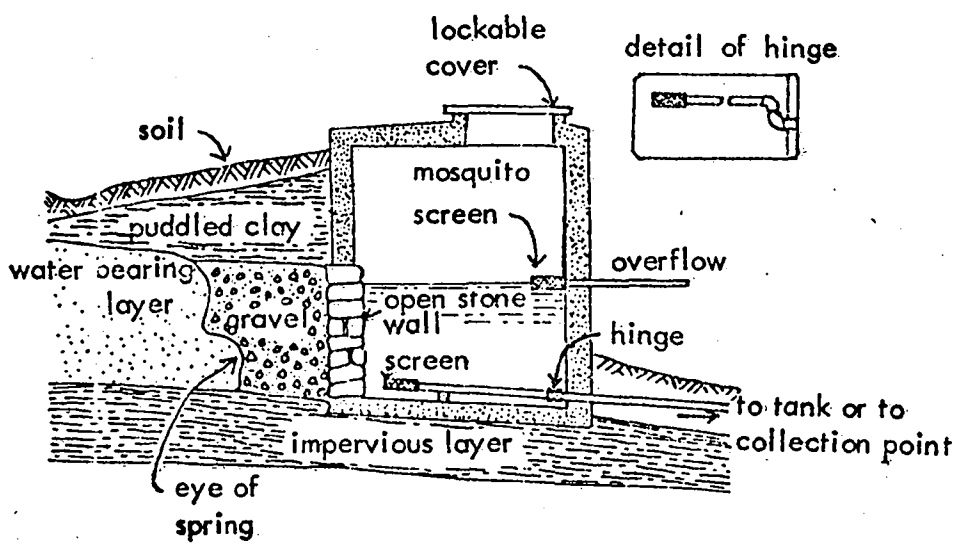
Protection of Springs. A spring box; the inset detail shows a hingemode with two pipe bends, enabling the screen to be lifted above the water for cleaning.
